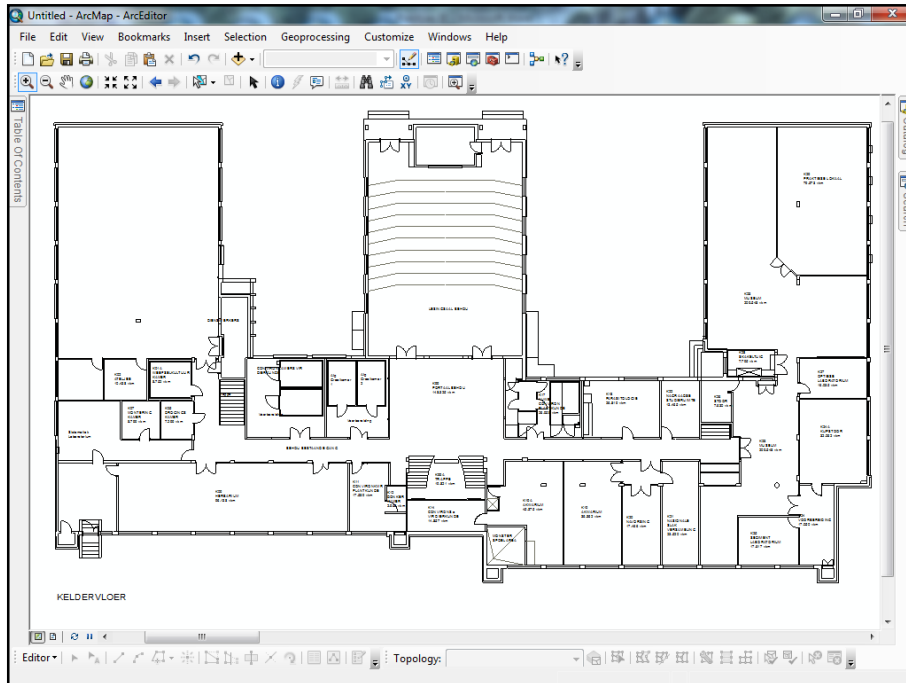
Basement floor of building E6 (Department of Technical Services, 2011)
